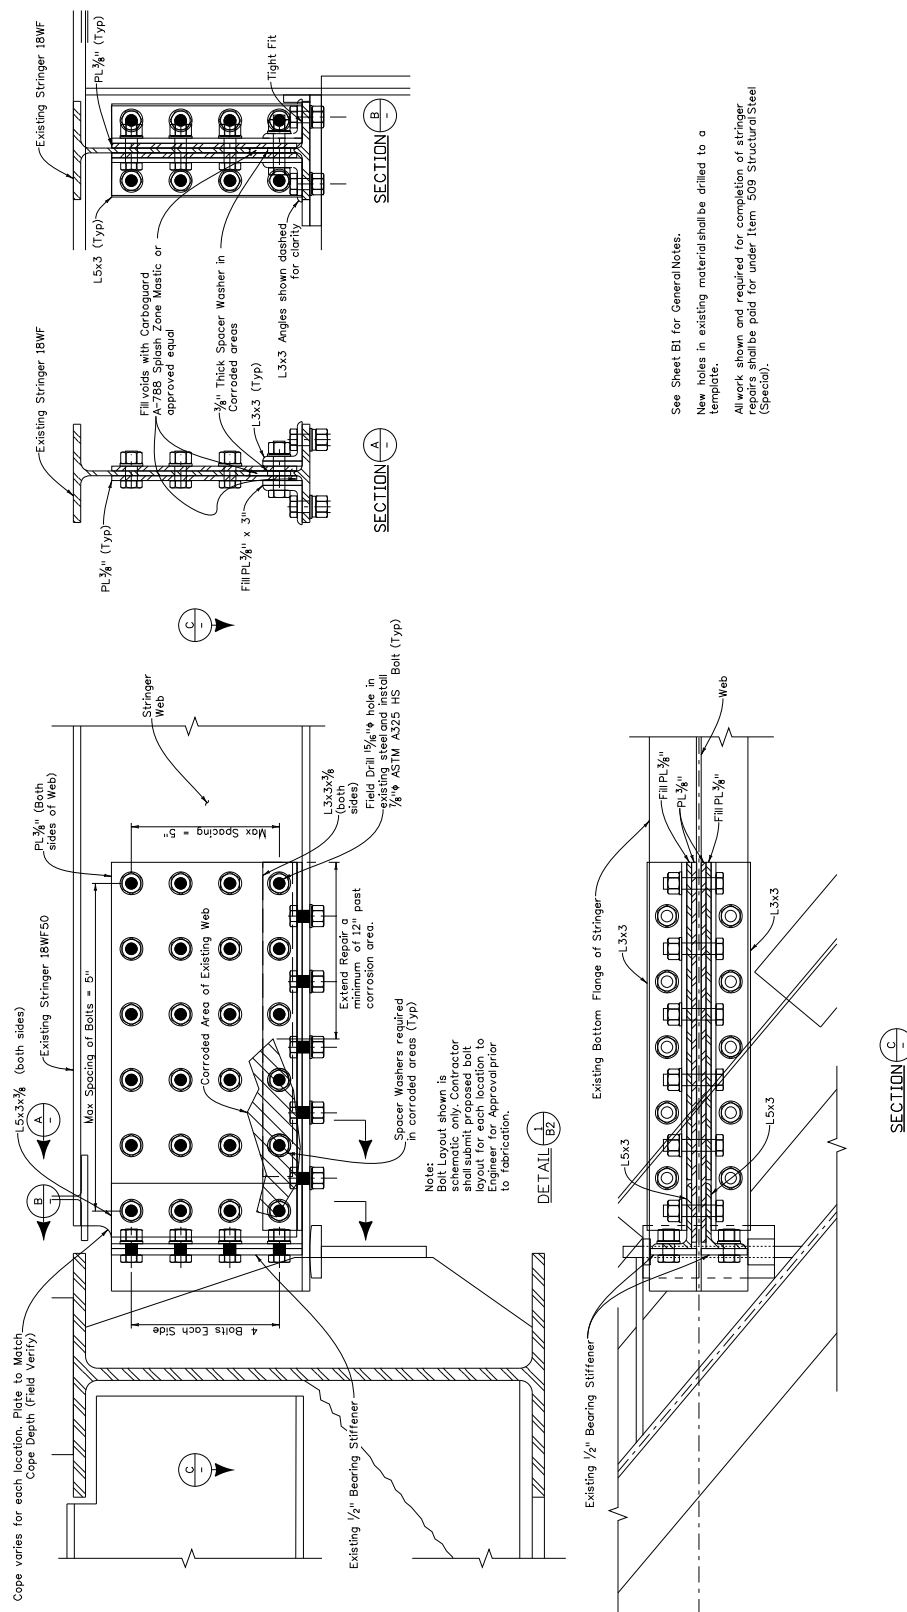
(K)-1 Sample Details for Adding Steel Plates to a Corroded Girder
